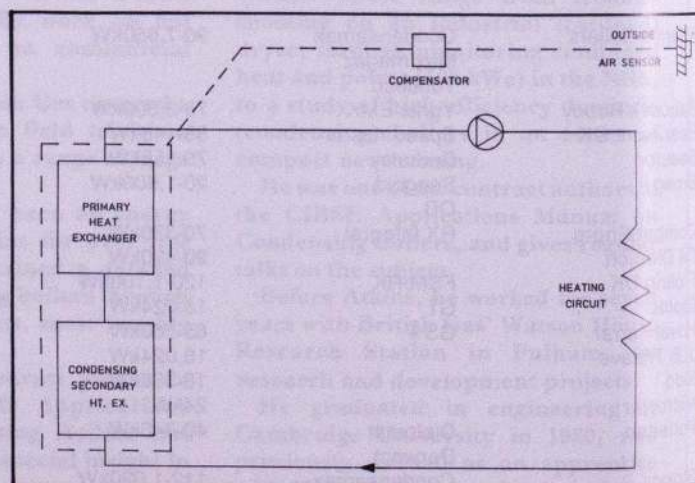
Condensing boiler with compensator acting directly on boiler.
